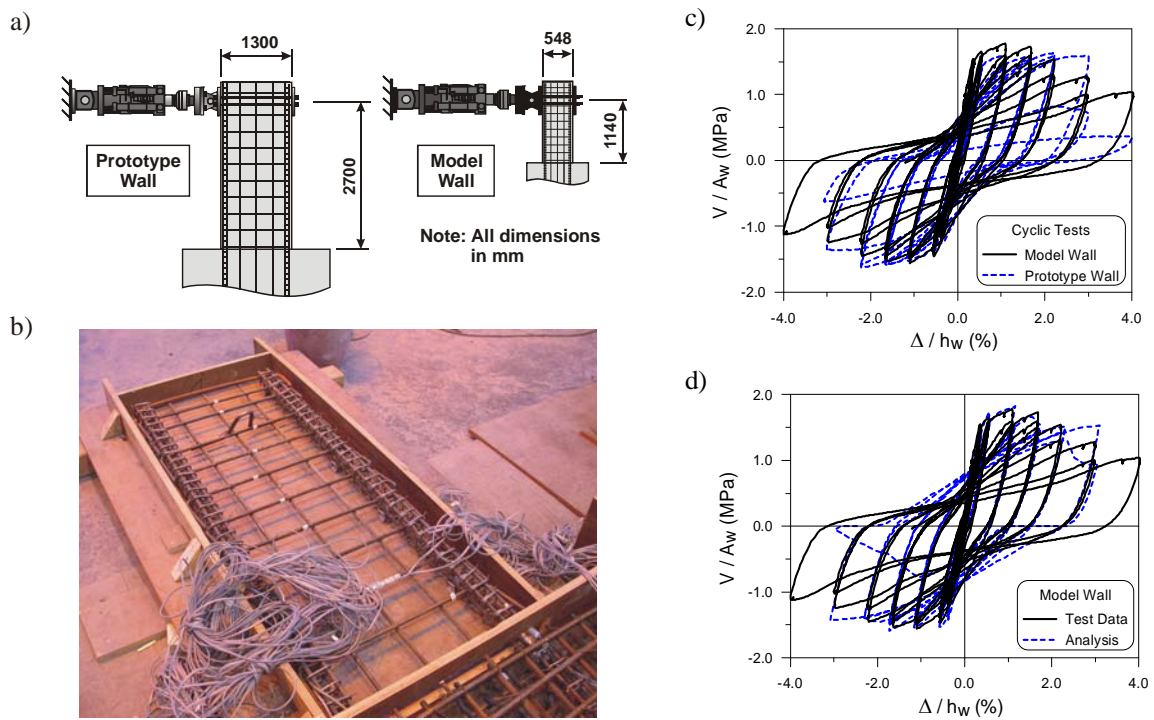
Preliminary testing of shear wall specimens: a) Geometry of the test walls; b) Model wall specimen under construction; c) Measured load-deformation response of the prototype and model walls under cyclic loading; and d) Analytical vs measured load-deformation responses of the model wall under cyclic loading.
